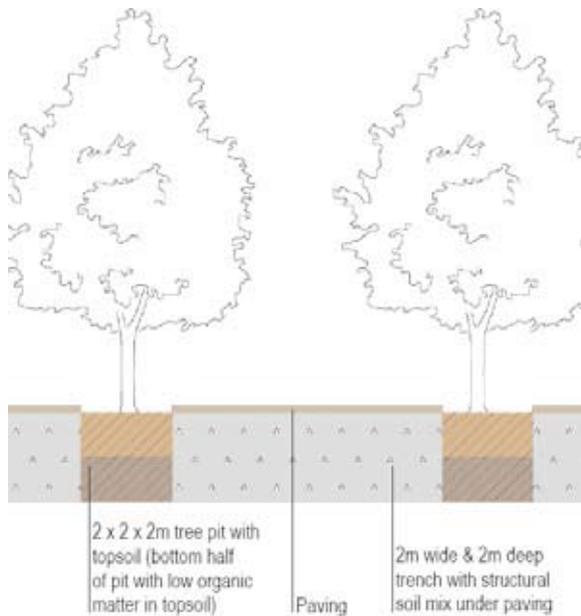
Use of Structural Soils in Paved Streets (Longitudinal Section)
